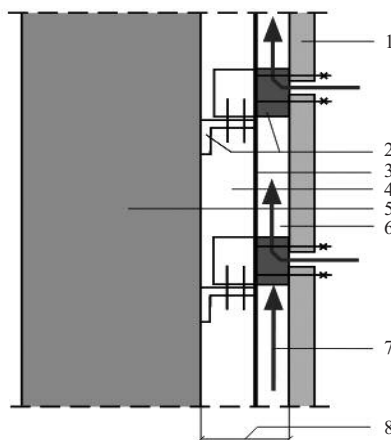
Schematic diagram of a ventilated façade: 1 – cladding; 2 – bracket system; 3 – vapor-permeable membrane (optional); 4 – thermal insulation; 5 – external wall of the building; 6 – ventilation gap; 7 – flowing air; 8 – extending of bracket system
